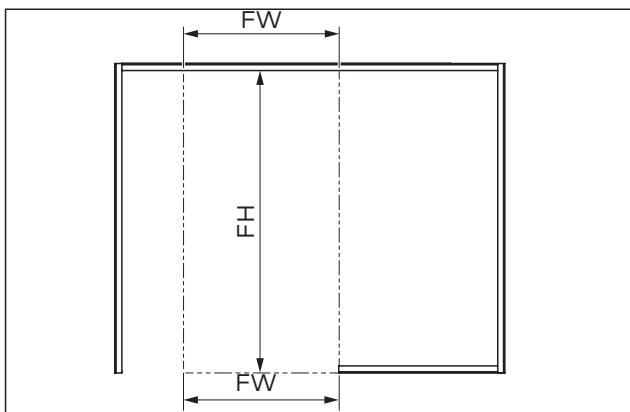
Example of dimensions for installing the door frame at the assembly location
